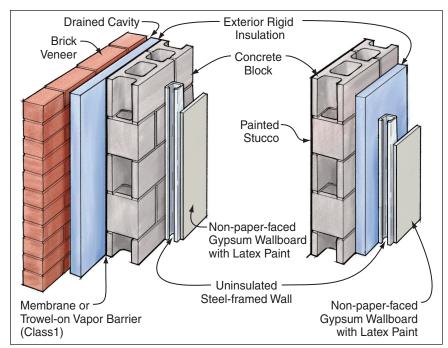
Recommended flood-resistant exterior mass wall construction. The following materials and methods will limit flood damage to exterior mass walls: 1) use concrete masonry with stucco or brick veneer (provide drainage cavity if brick veneer is used); 2) use rigid, closed-cell insulation; 3) use steel framing; and 4) use non-paper-faced gypsum wallboard painted with latex paint (Source: Coastal Contractor Magazine and Building Science Corporation).
